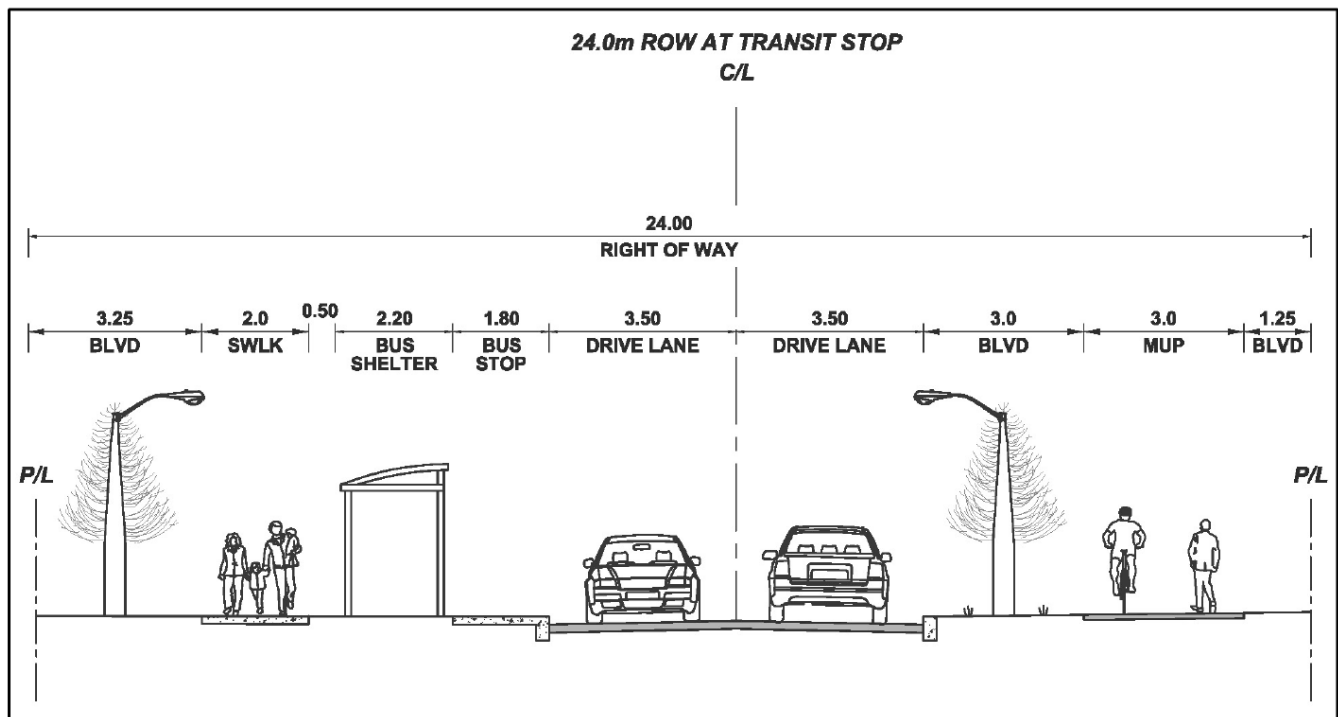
Proposed Cross-Section for 24 m Collector Streets
